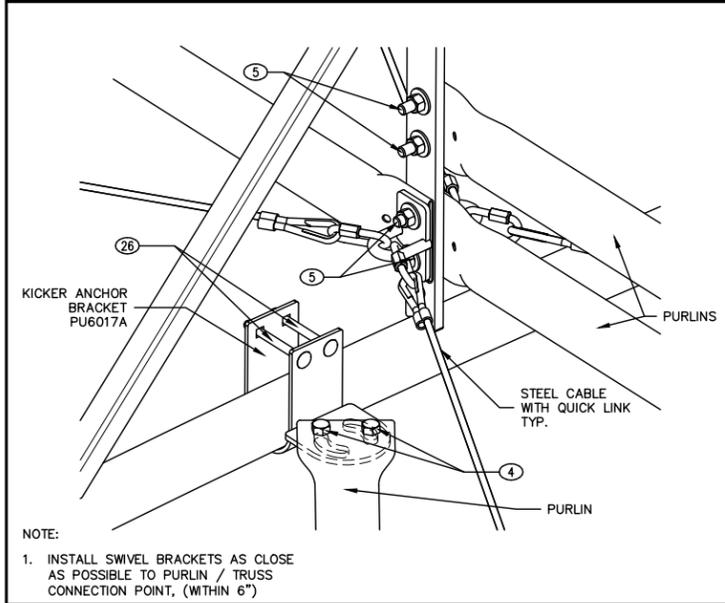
ENDWALL UPRIGHT CONNECTION AT TRUSS - 4X6 HSS
